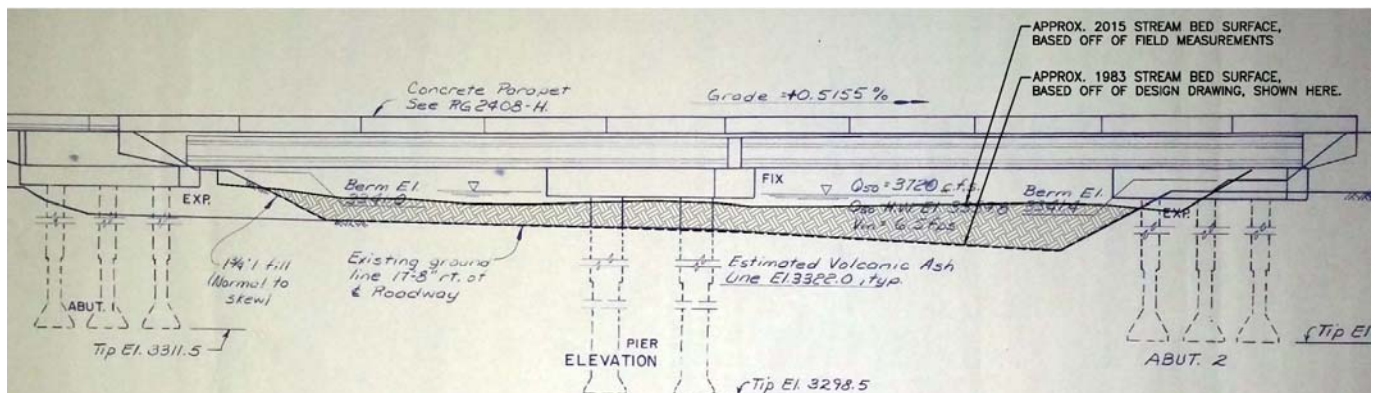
1983 as-built drawing of Camas Street bridge with measured 2015 bed elevations superimposed on cross section. View is looking upstream.
